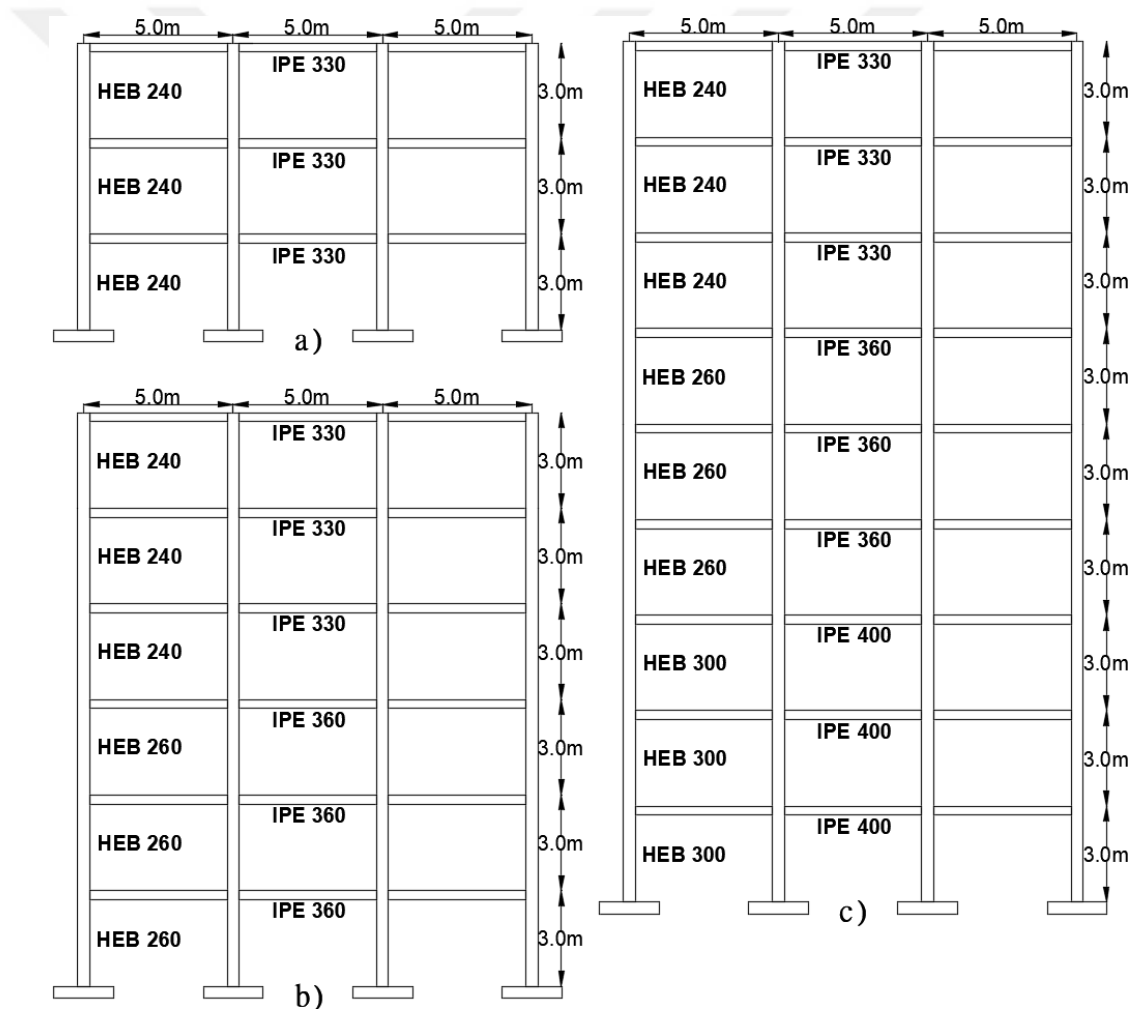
Elevation views of a) 3-storey, b) 6-storey, and c) 9-storey SMRF [119]
